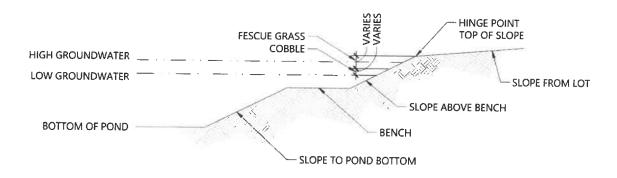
EXHIBIT K. POND WATER LEVEL ILLUSTRATIONS & TYPICAL CROSS-SECTION
